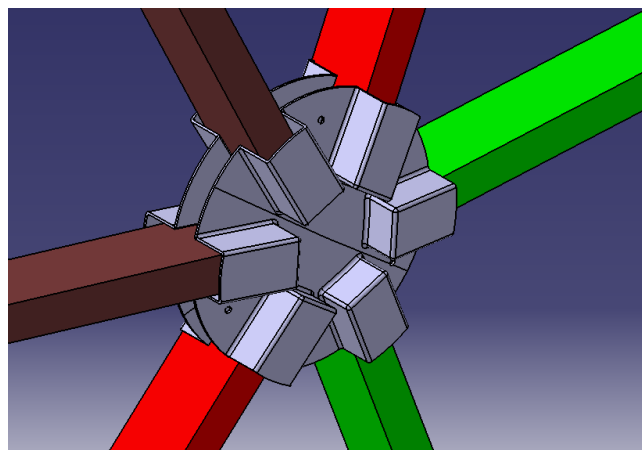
Mounting scheme for joint 6 with 3 rod types.
